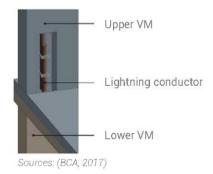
Example of Typical Lightning Conductor Connection between VMs
